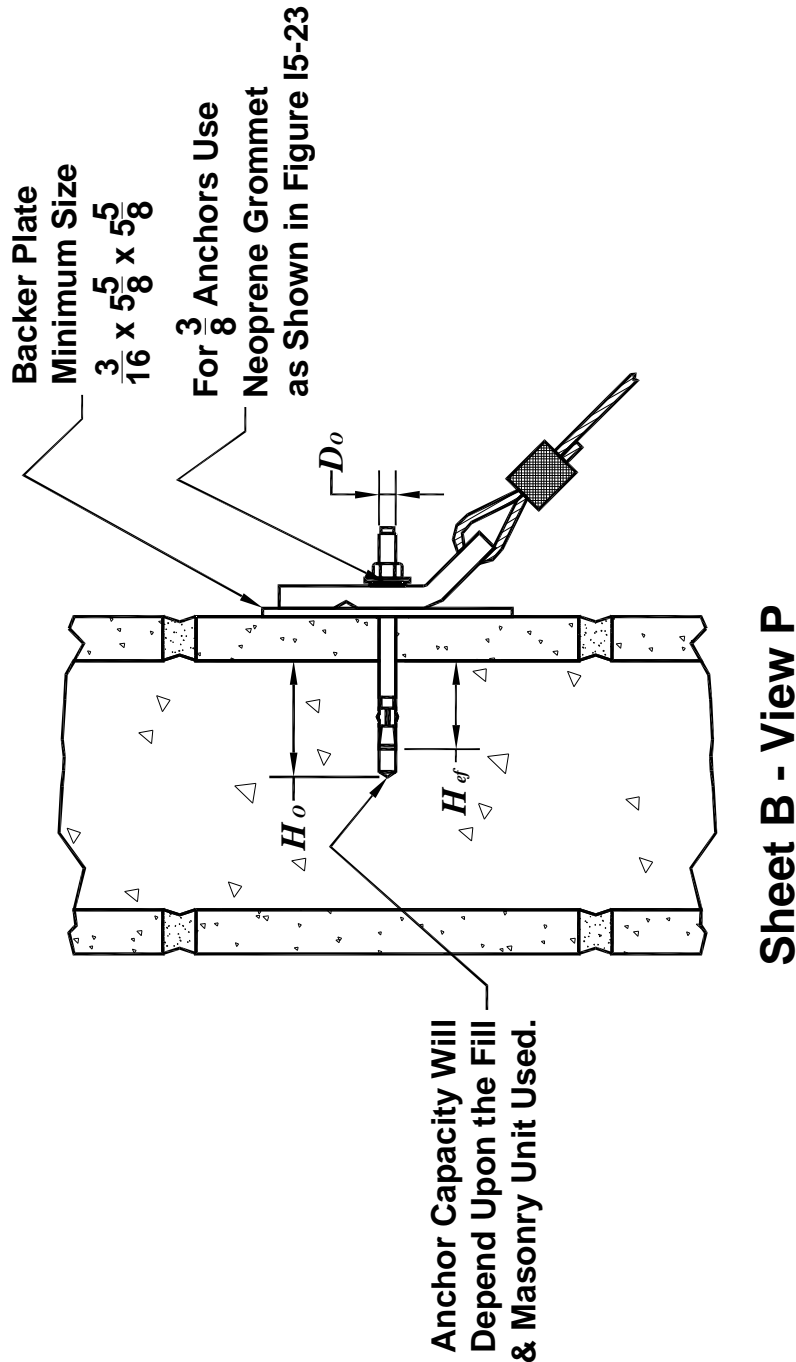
; KSCA Wedge Type Anchor Attachment to a Filled CMU Wall
